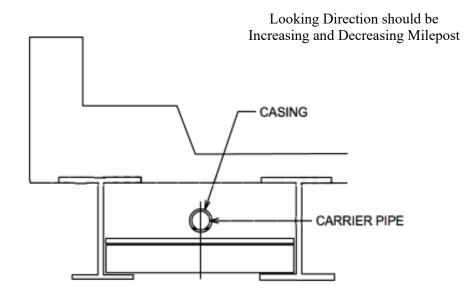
Plate VI - Sample Pipe Plan and Section Under Railway Bridge
